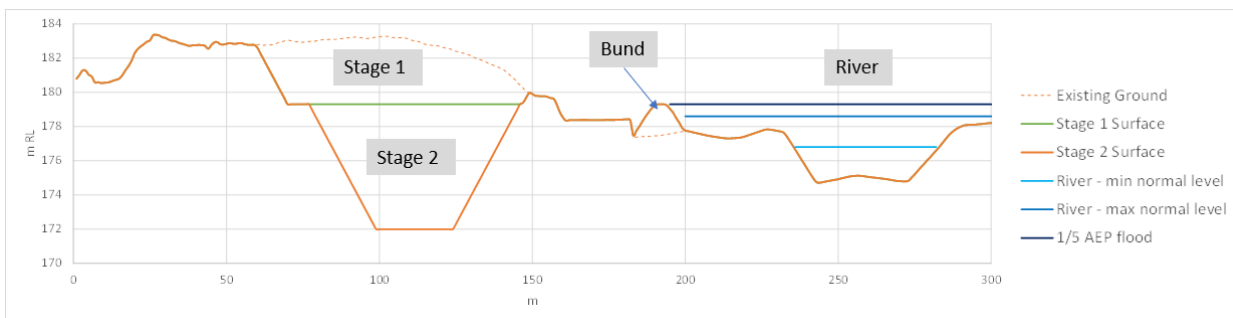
Cross-section through excavation, showing existing ground surface, Stage 1 excavation, Stage 2 excavation, bunding, and main river channel.
